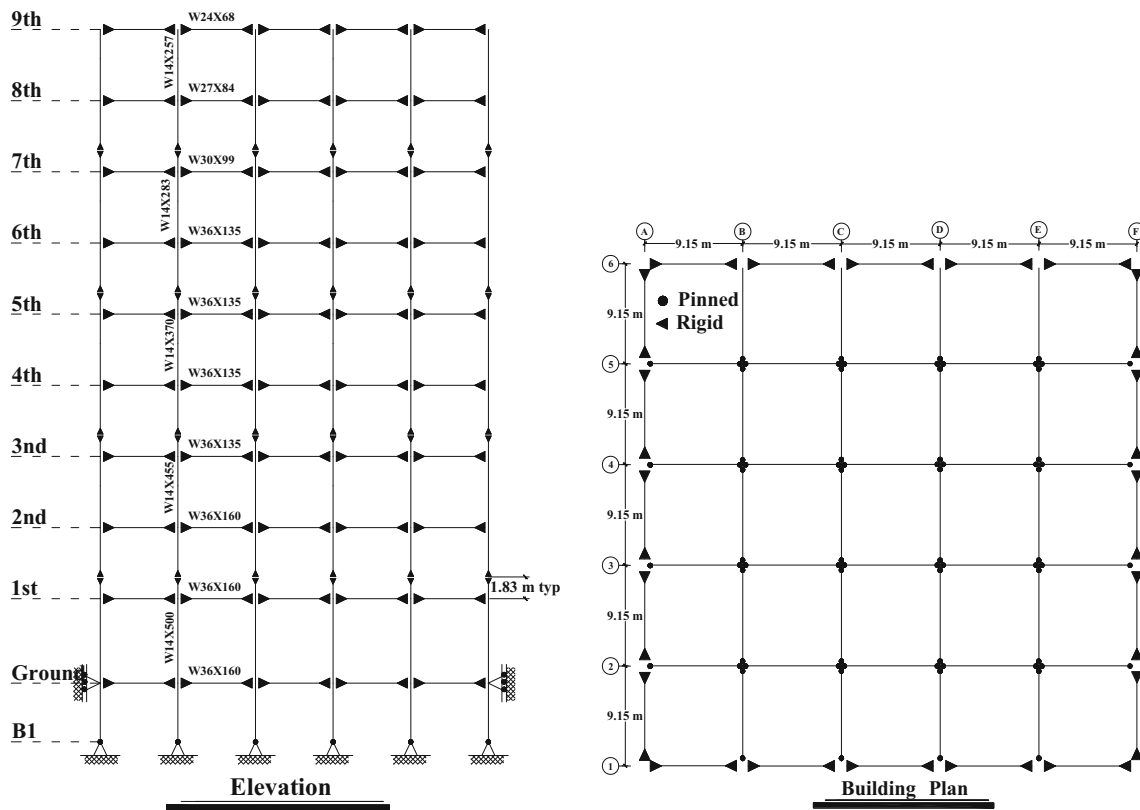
SAC9 9-story building used for verification of the modeling method (adapted from [25])
